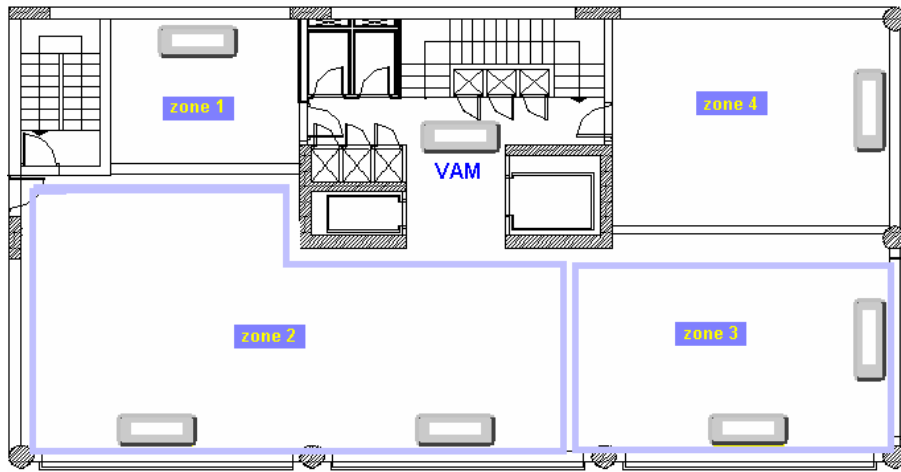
6<sup>th</sup> Floor and thermal zones plan of BYTE
